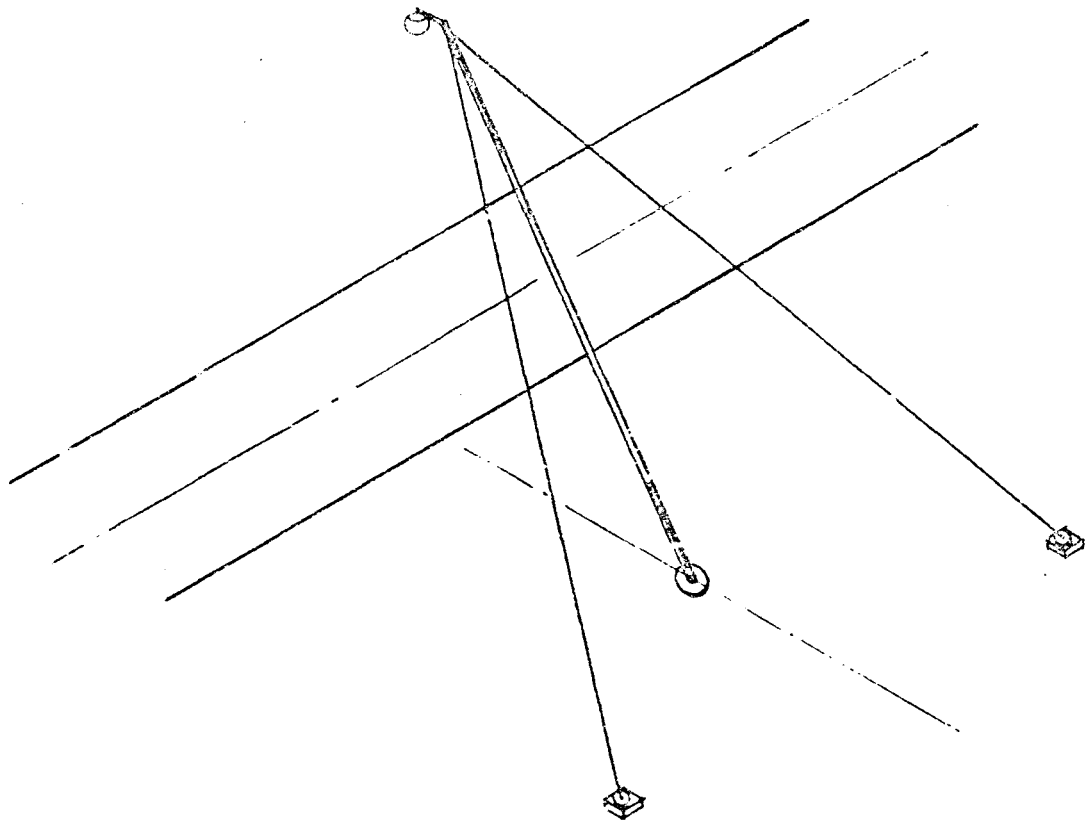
ISOMETRIC SCHEMATIC DRAWING OF CANTILEVER-SUPPORTED LIGHTING SYSTEM CONCEPT
